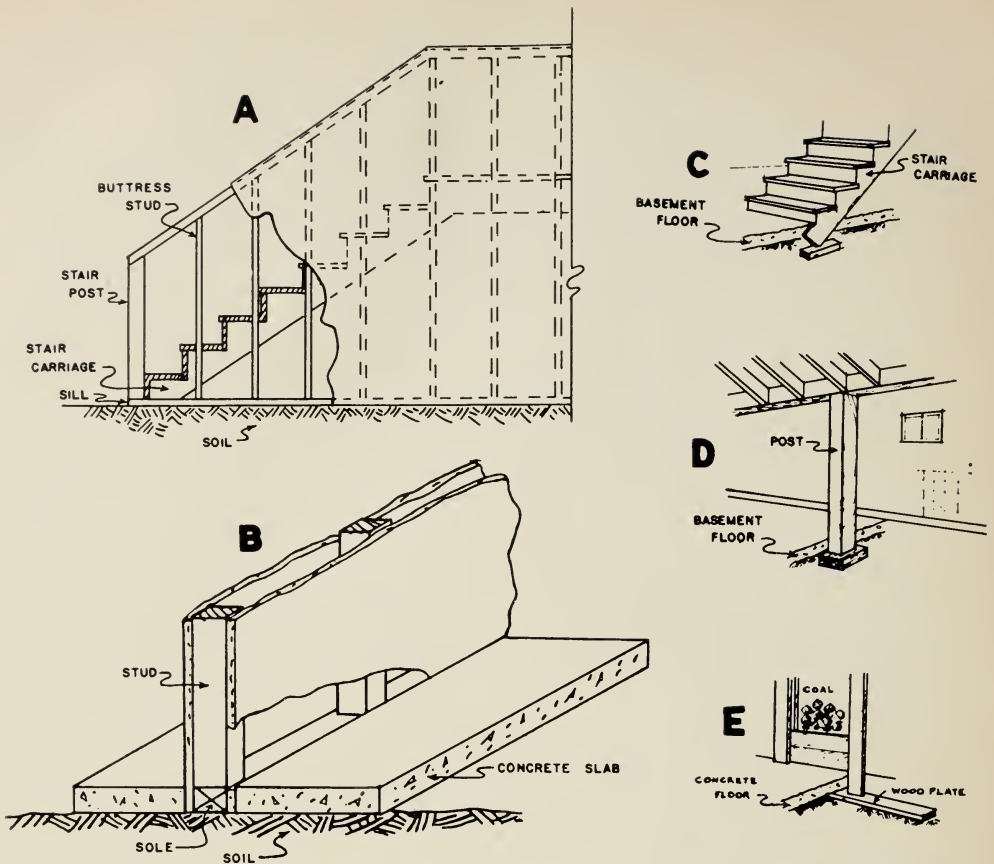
Common wood-soil contacts: A. exterior stairs of stucco-frame construction; B. partition wall extending through concrete slab; C, D, E. typical examples of wood-soil contact in basements. (From Heal, 1951.)
